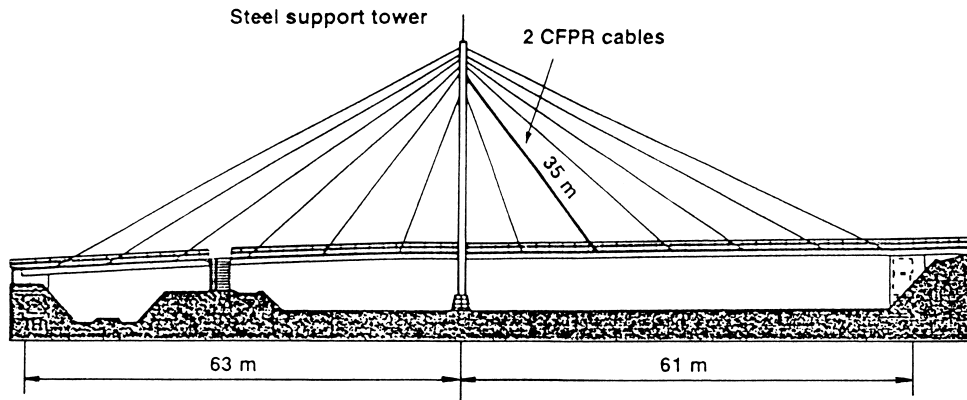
A cable-stayed bridge with one pair of CFRP cables and 11 pairs of steel cables for support.
